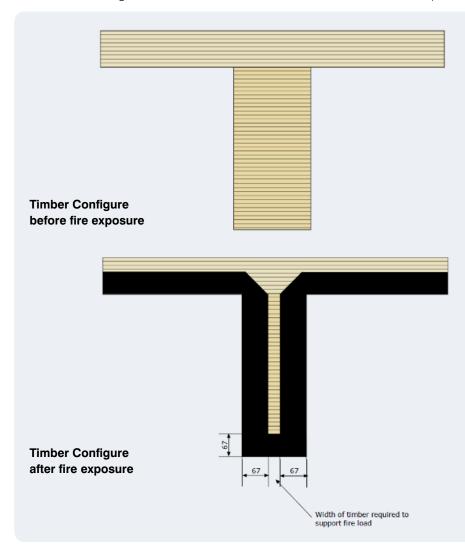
Comparison of Timber Cassette floor joists and Residual Section after 90 minutes of fire exposure.
